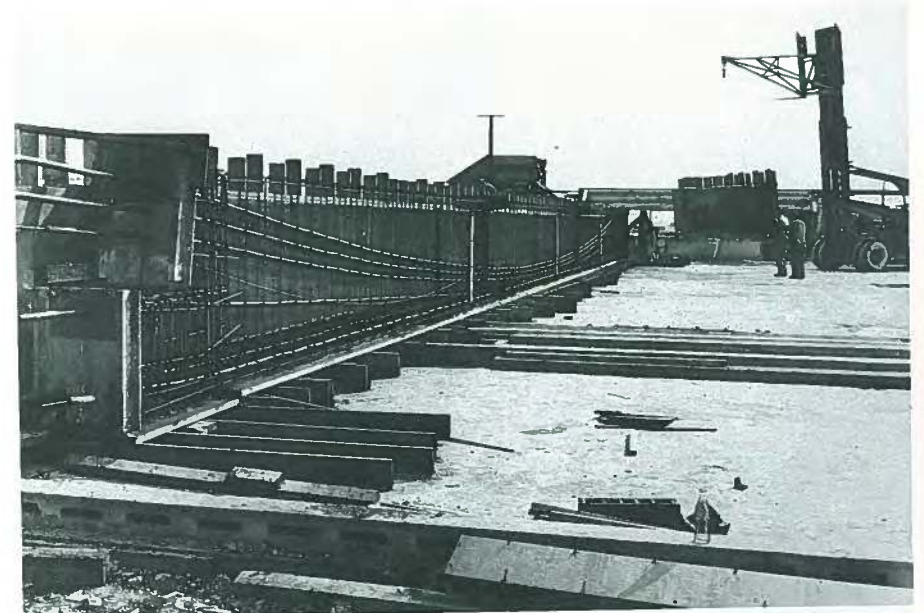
Formwork for Klickitat County bridge girder showing rubber extractable cores and reinforcing in place prior to casting. Note dividers to separate beam into three segments.
